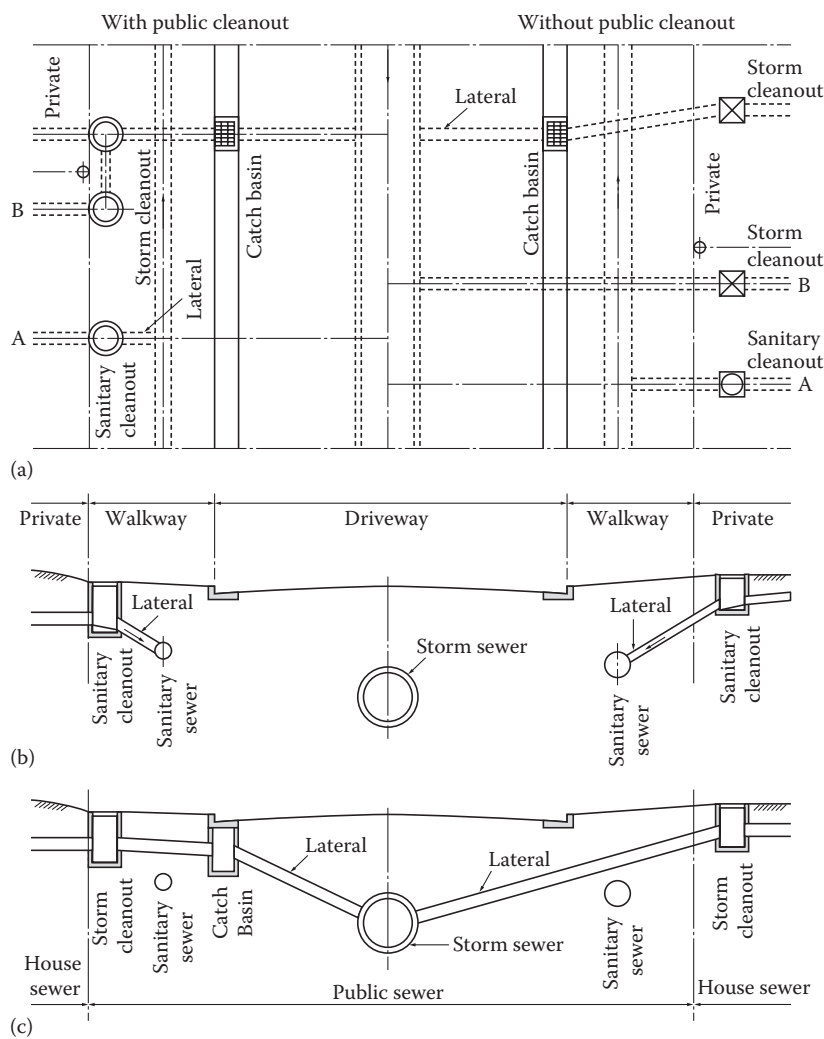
Lateral in a separate system: (a) plan, (b) A–A section, and (c) B–B section.
